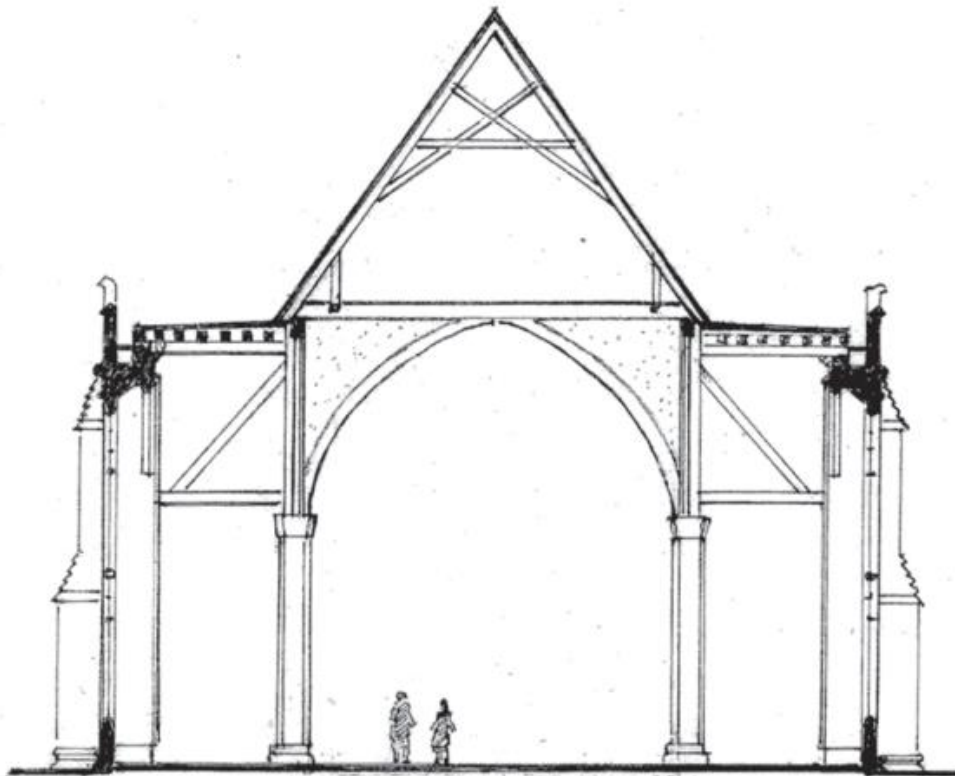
Section through Burnell's great hall, with a conjectural reconstruction by J Ray Harrison of the aisles and roofs to give an impression of the scale and grandeur of the interior. This shows one of several possible roof forms over the assumed aisles and 'nave' of the hall. Copyright J Ray Harrison.
